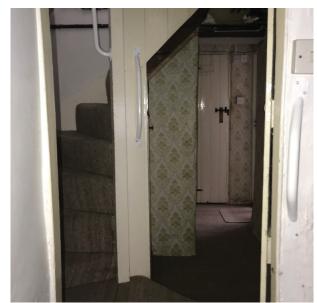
Dark stairwell with steep staircase case and step 1 plinth
